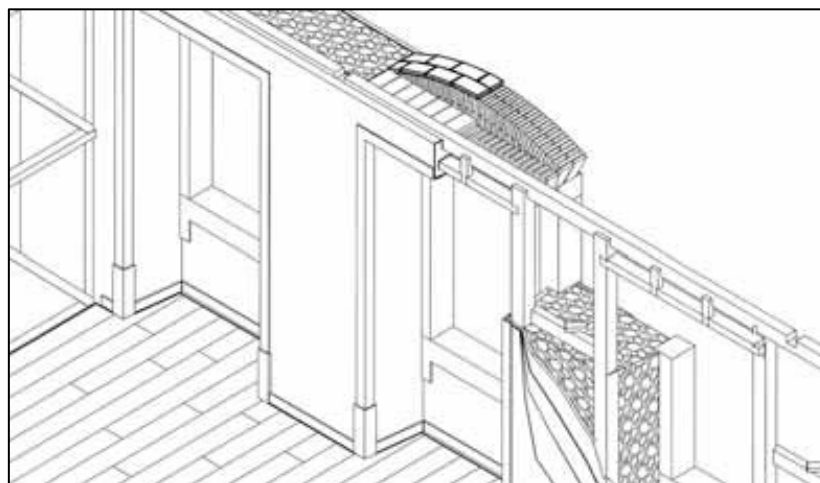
Section in 3D for an external wall from internally (Lisboa, 2005)
